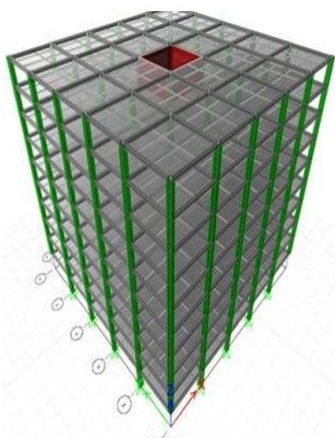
Impact of mixing filler slabs and shear walls in a multi-story reinforced concrete structure
